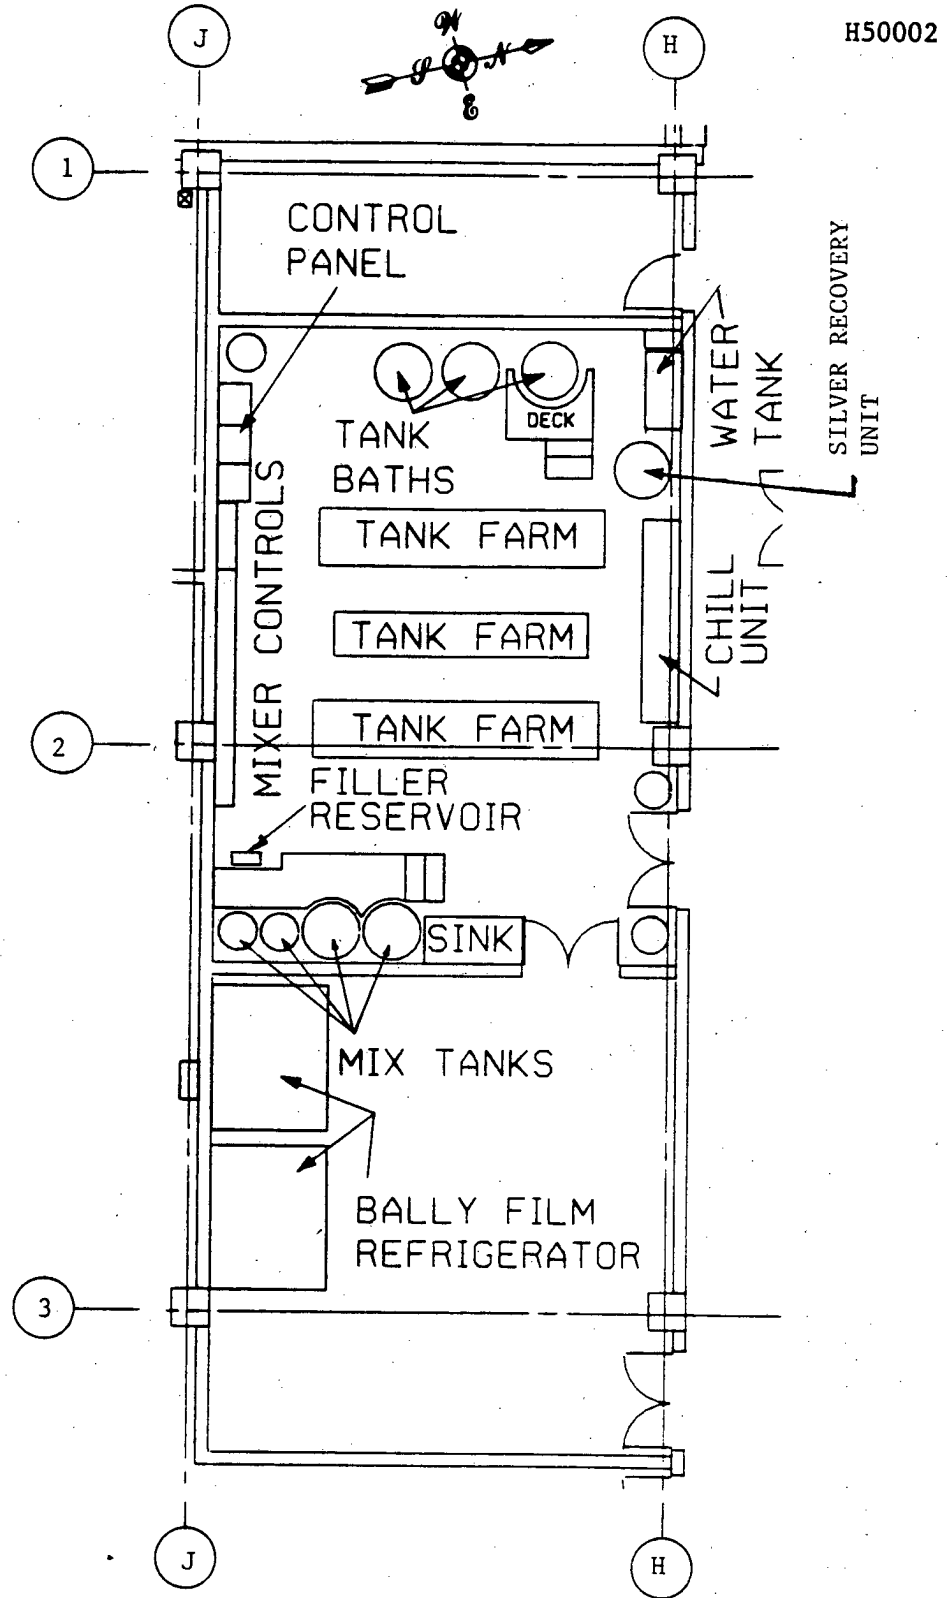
TANK FARM ARCHITECTURAL LAYOUT
